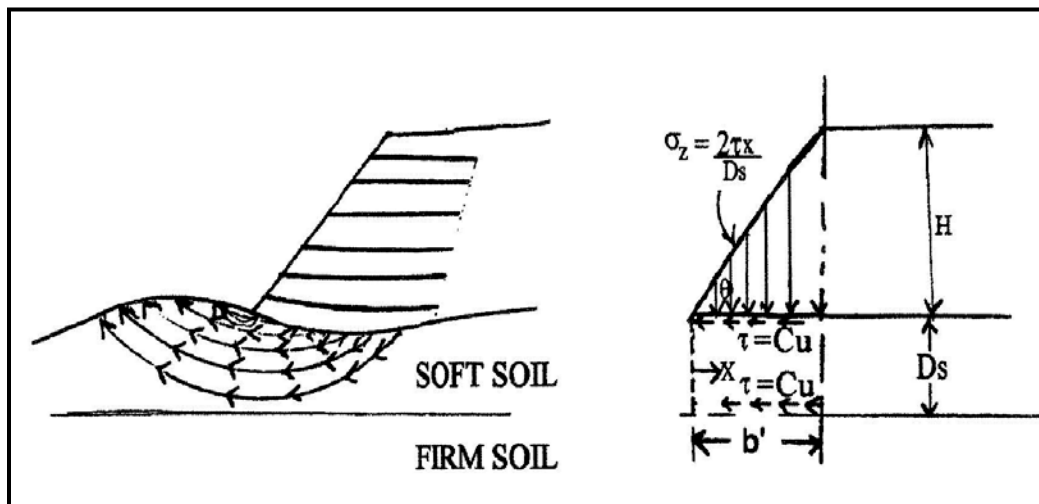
, Local Bearing Failure (Lateral Squeeze)
